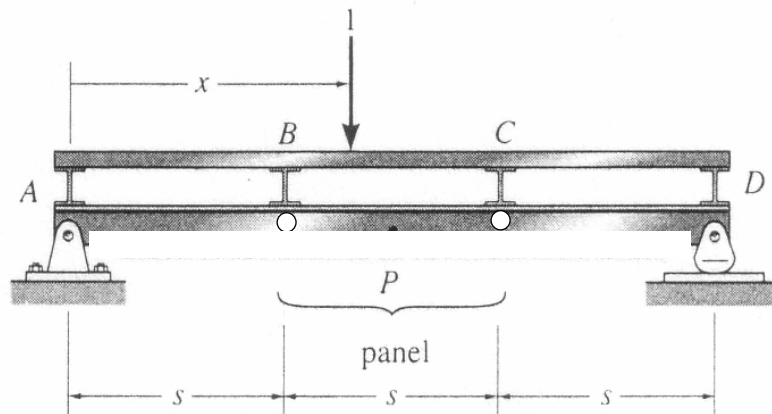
Bridge deck transmitting load to bottom cord of truss.
